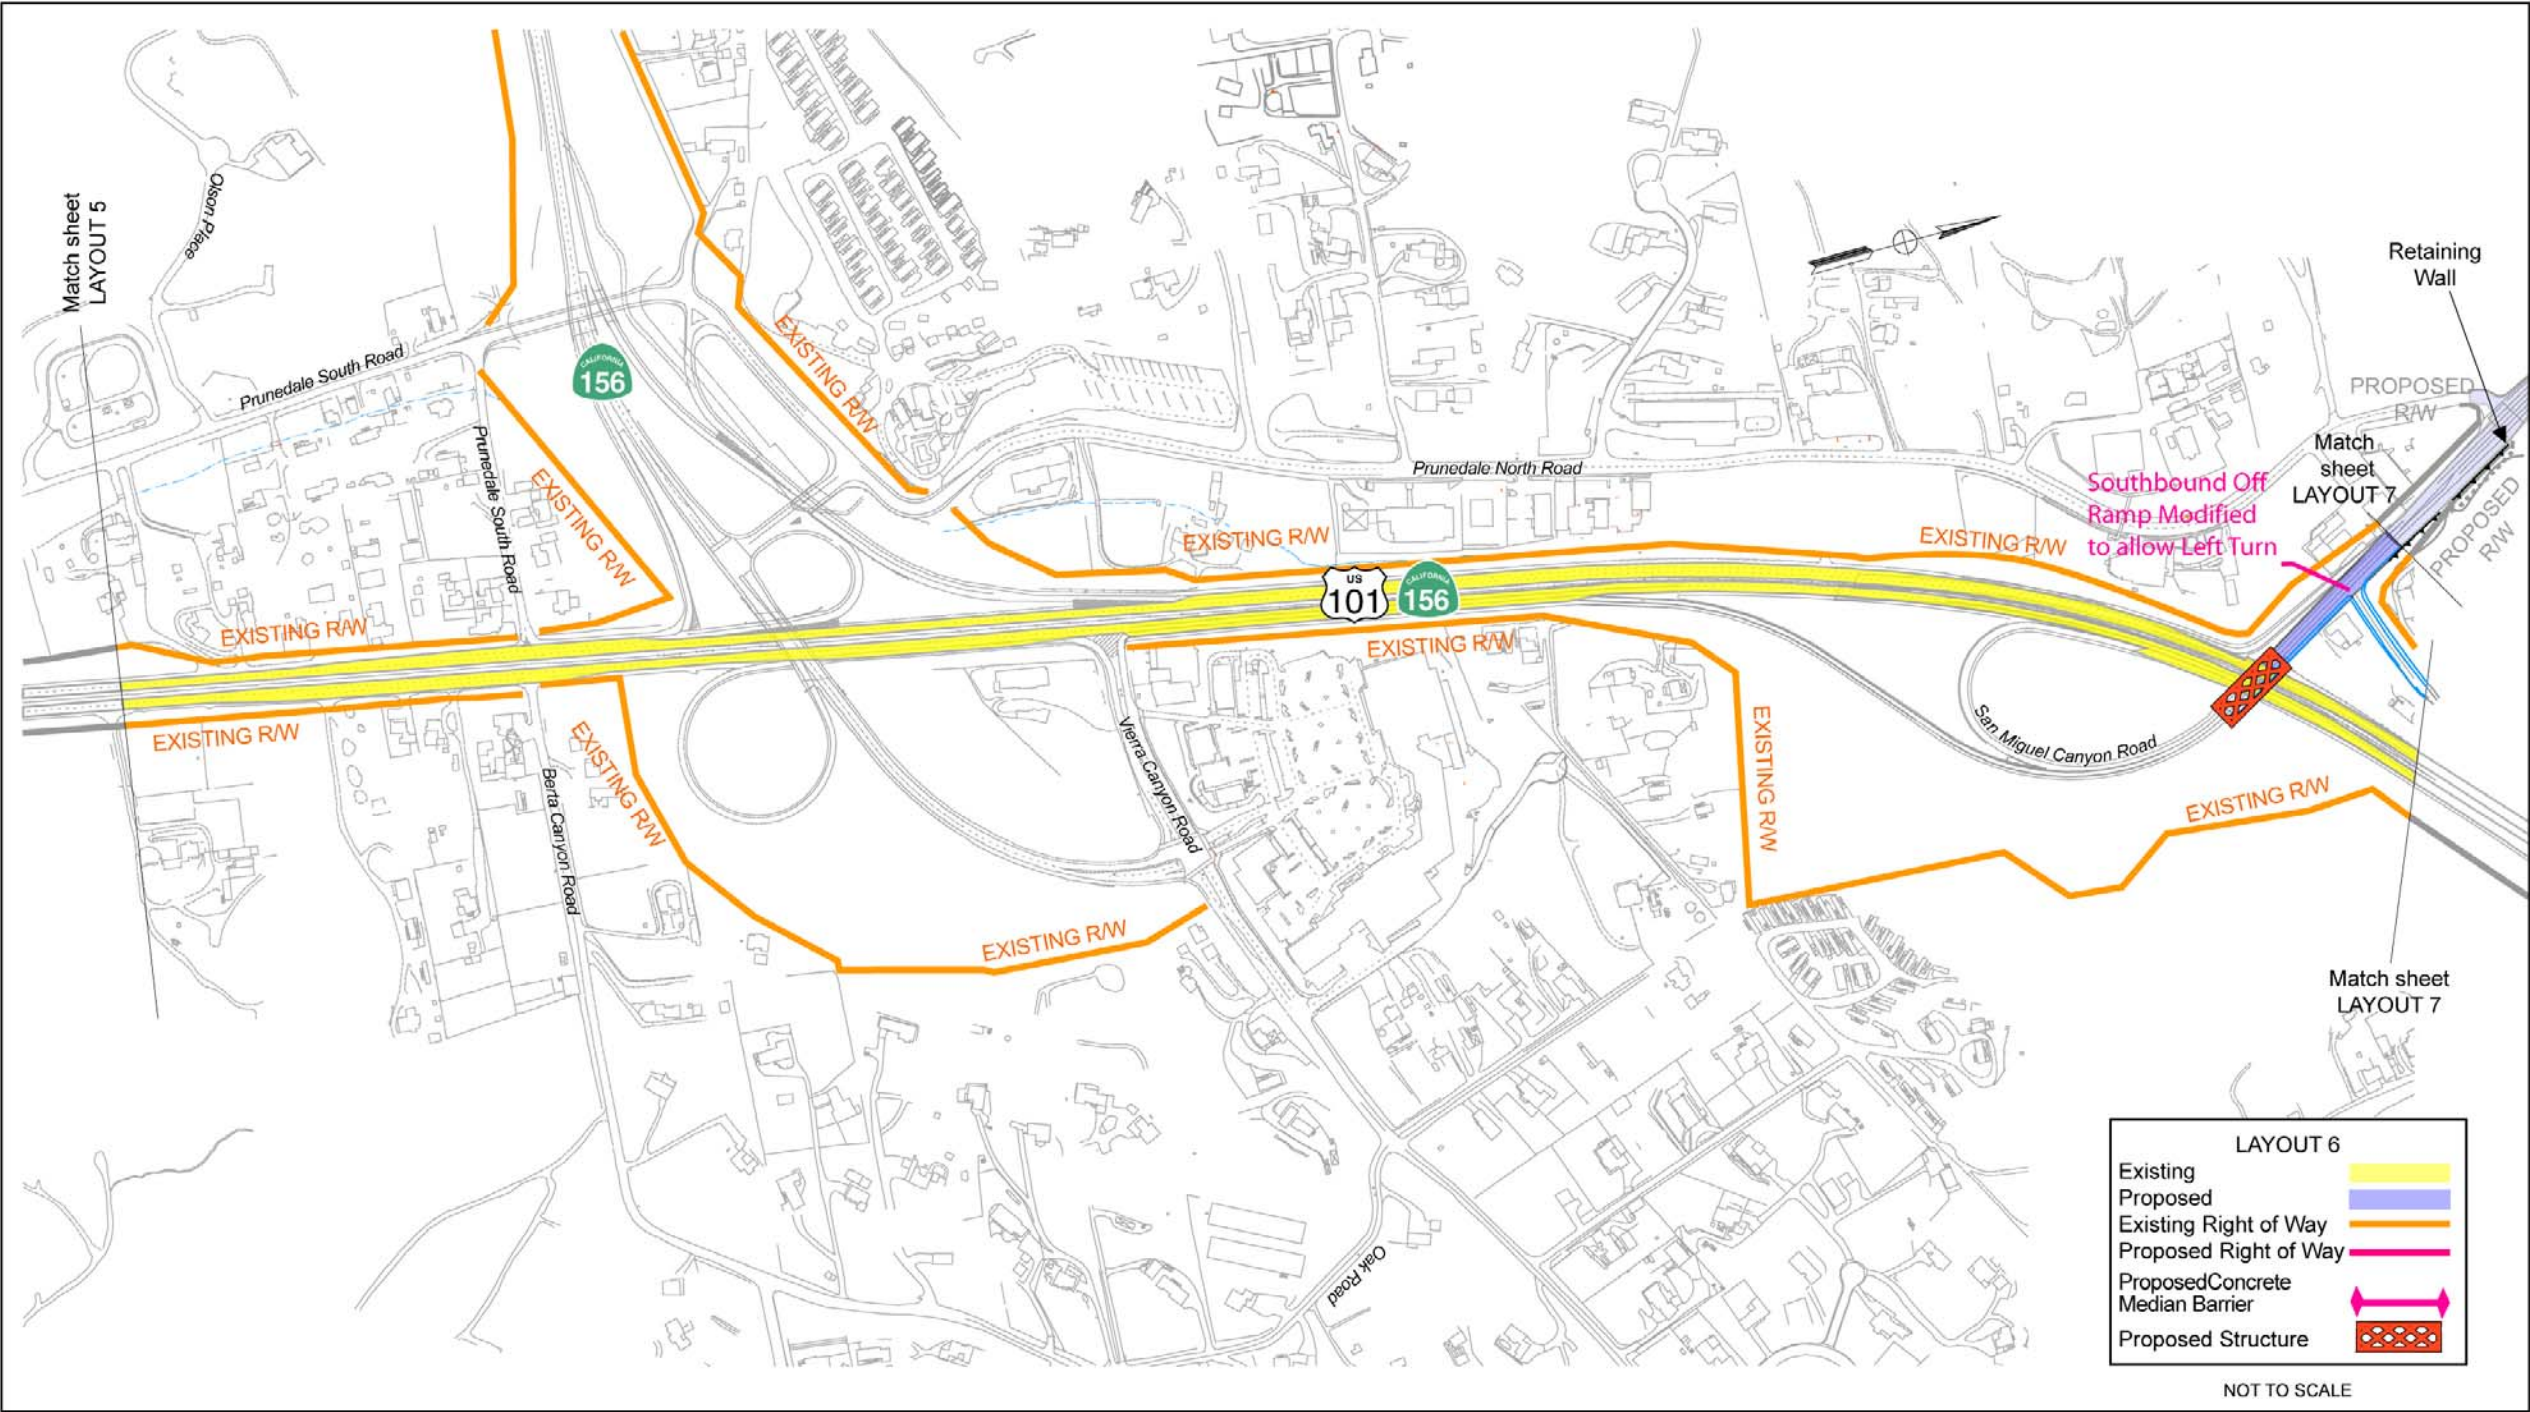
Build Alternative Design, Vierra Canyon Road/San Miguel Canyon Road Location
